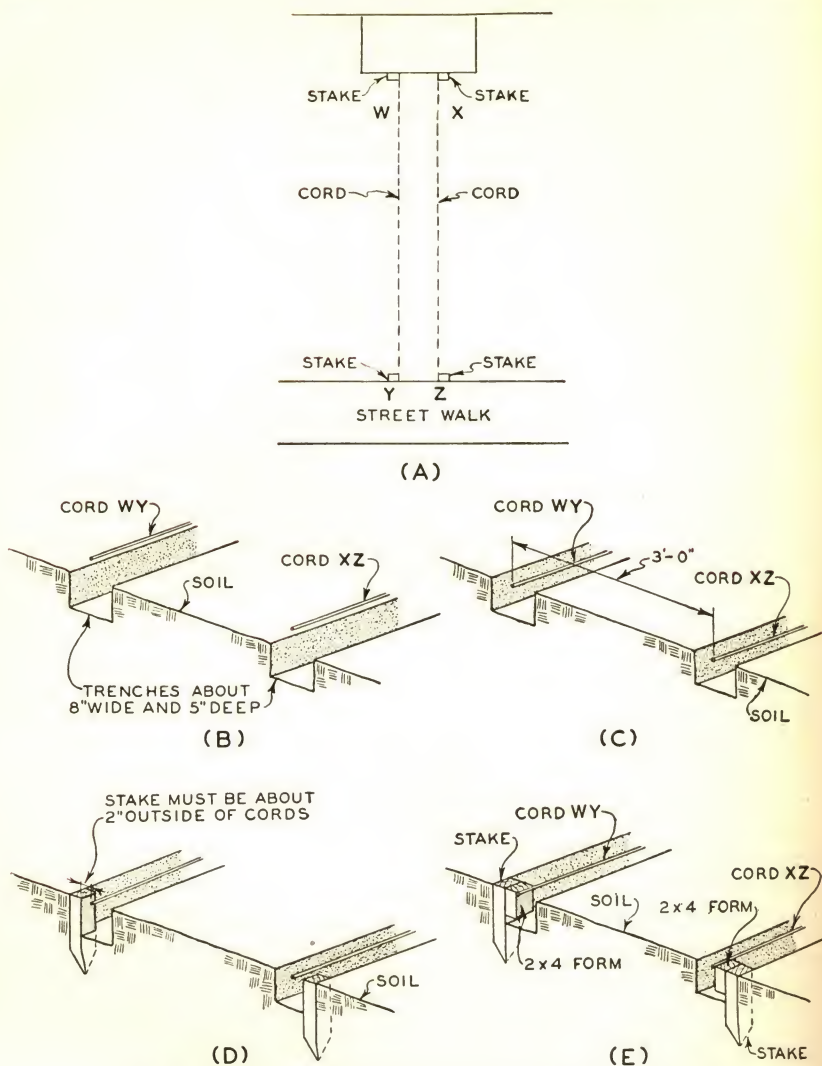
Building Details for Concrete Approach Walk in Fig. 20
